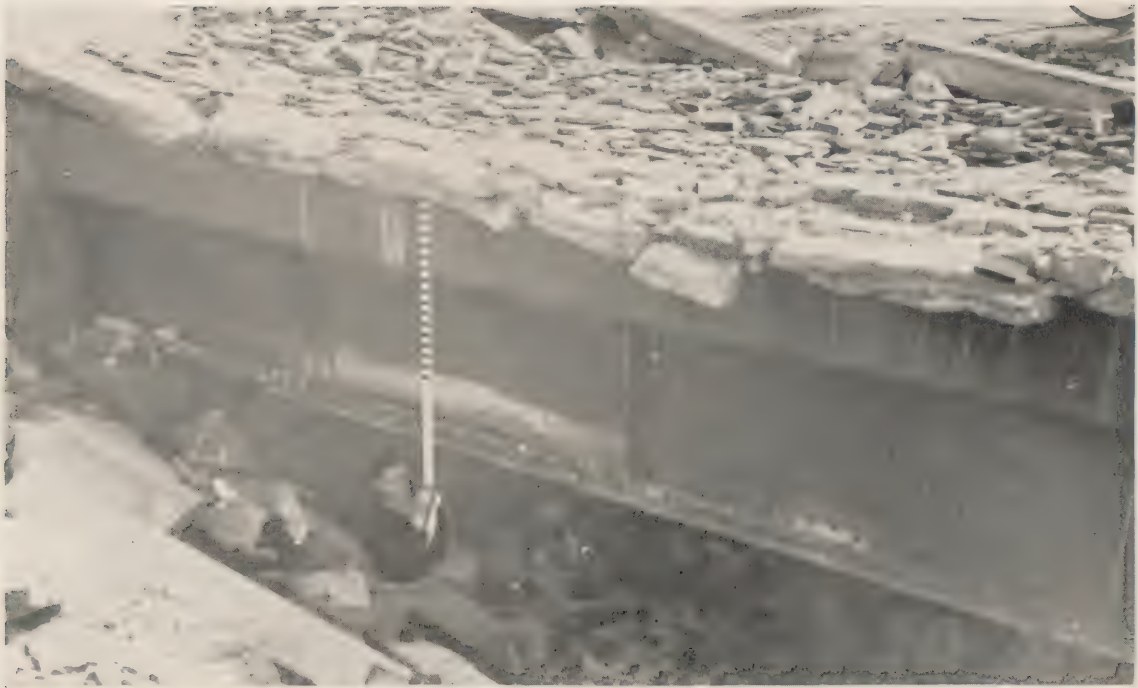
XII. Bridge 24. Northeast corner of steel-plate girder. No structural damage by blast.
